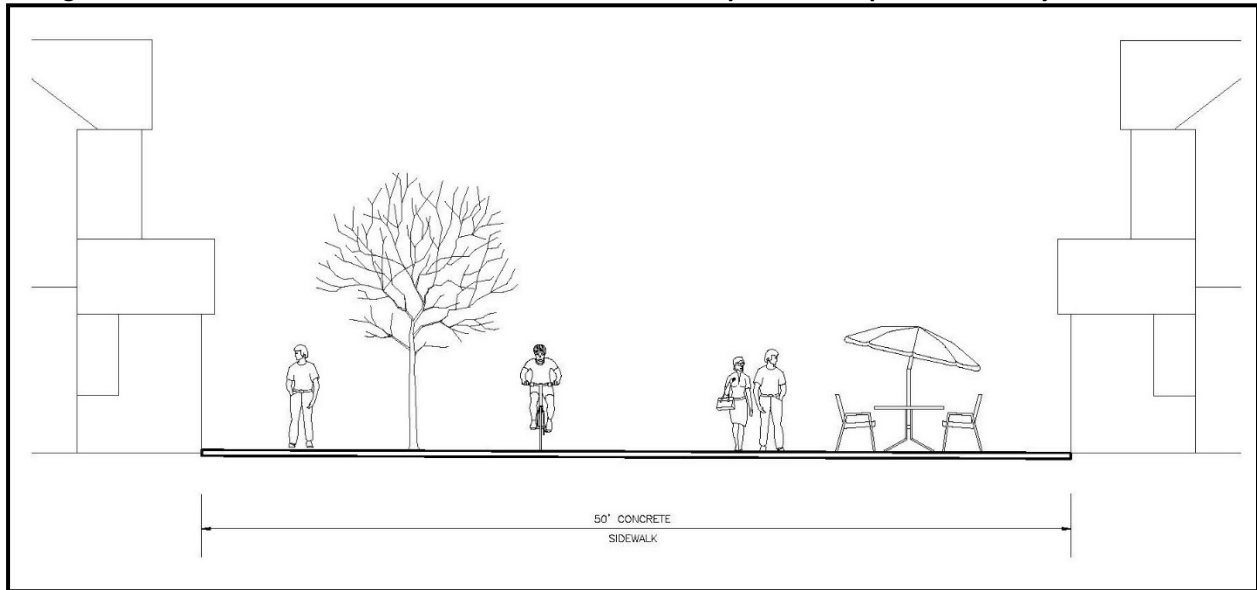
Commercial Connector Roads in Planned Development – Proposed Roadway Section TC-50
